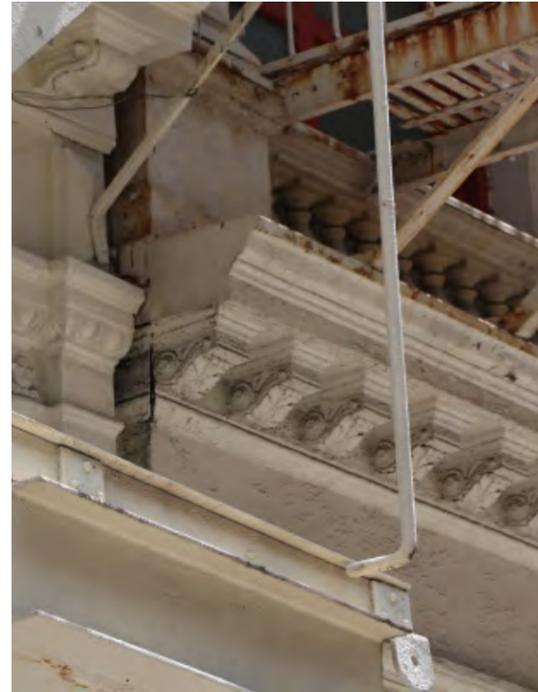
Second floor, north end. Signs of corrosion at cast iron and fire escape components.
